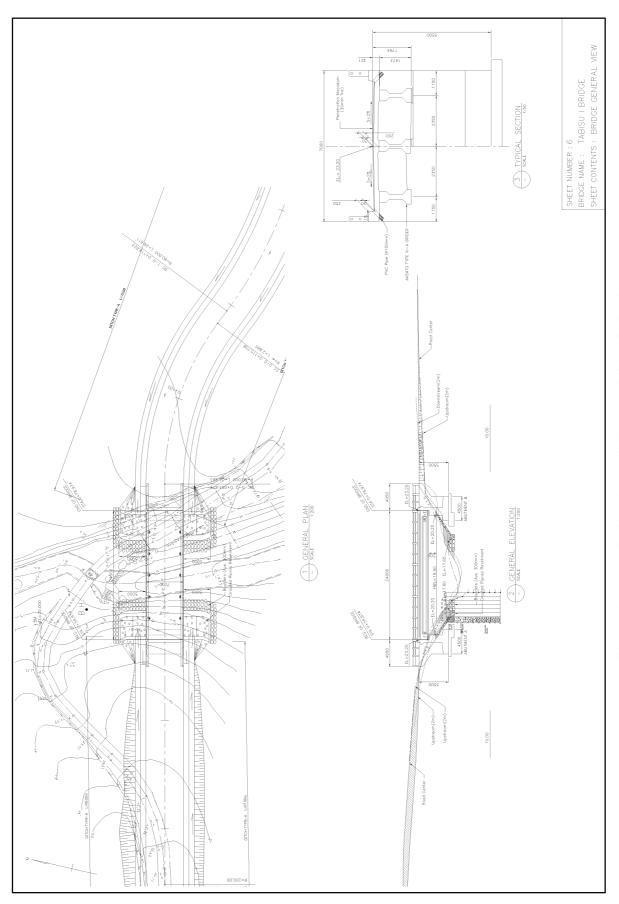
Bridge General View of Tabisu I Bridge
